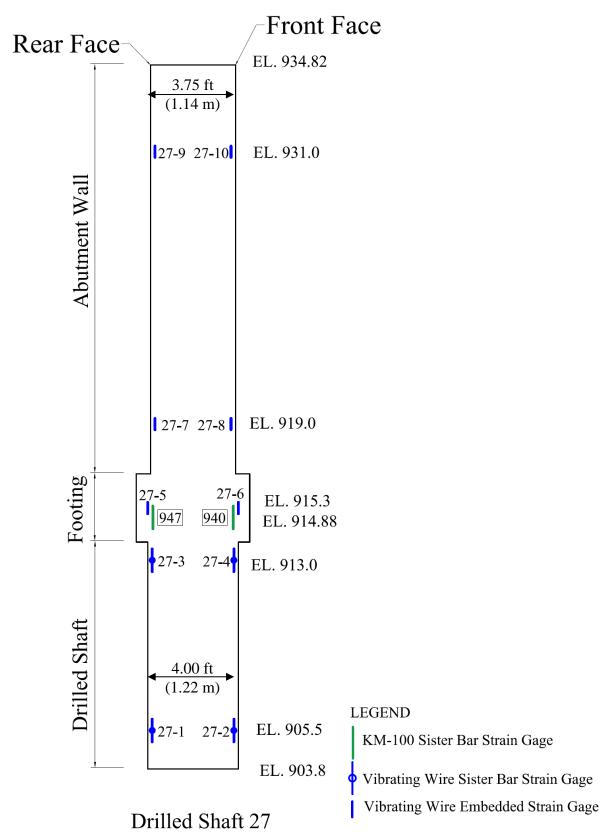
Gage locations in Drilled Shaft 27, footing, and abutment wall (EL in ft: 1 ft = 0.305 m).
